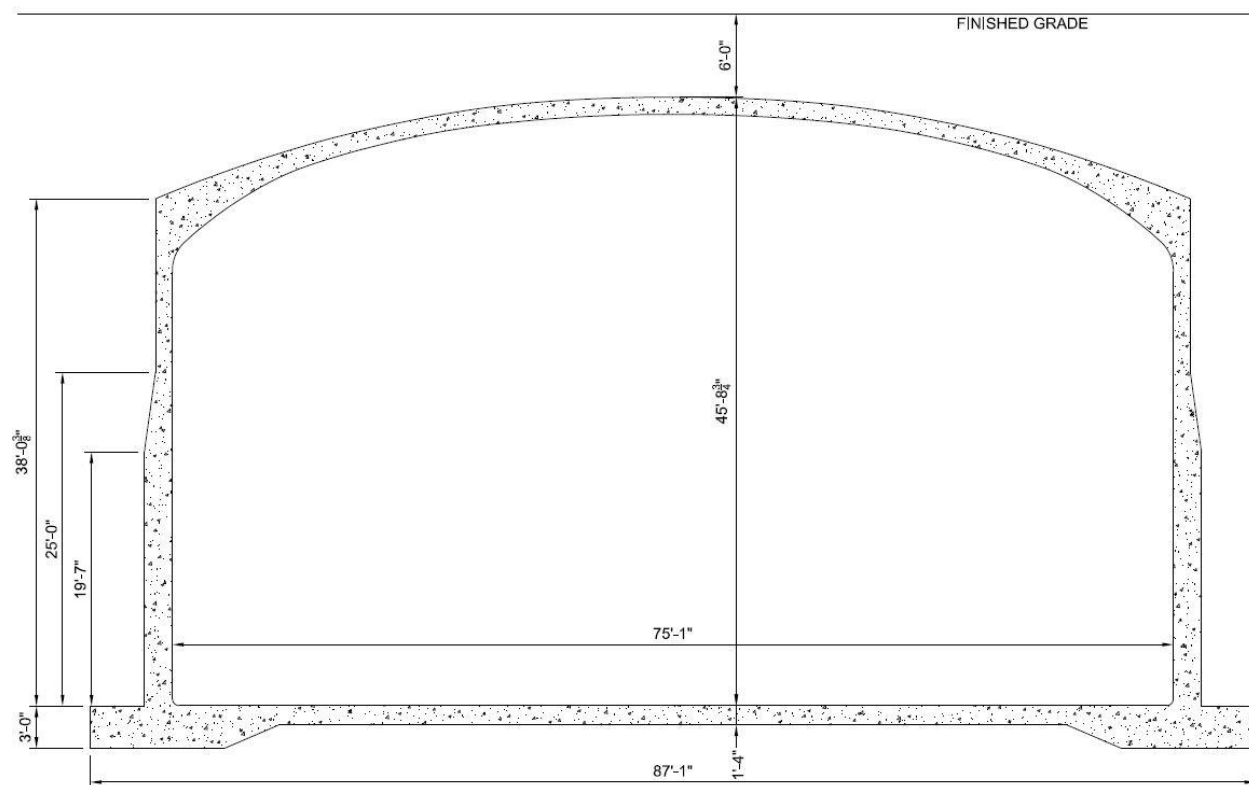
Tank Type IV-B Cross-Section A Tank Farm (H-2-55911)
